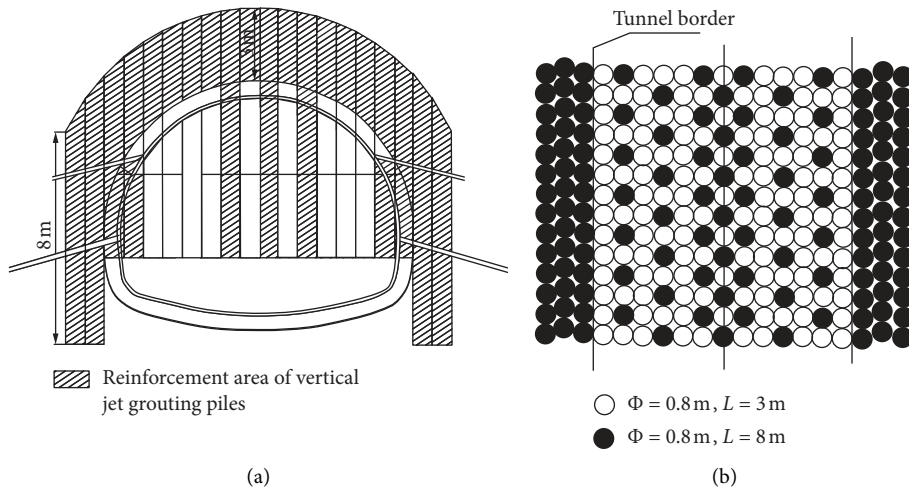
Arrangement of vertical jet grouting piles. (a) Vertical section, (b) horizontal section [39–41].
